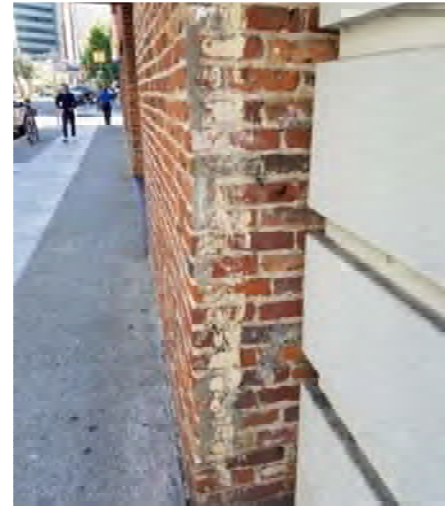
447 Battery Street, corner of primary façade and north façade which abuts the adjacent building. Patched concrete and former painted sign visible.
